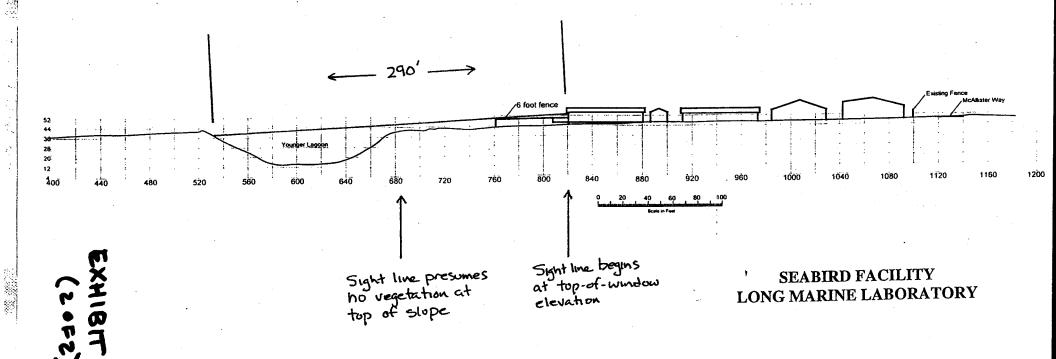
EXHIBIT F: YOUNGER LAGOON CROSS SECTION
